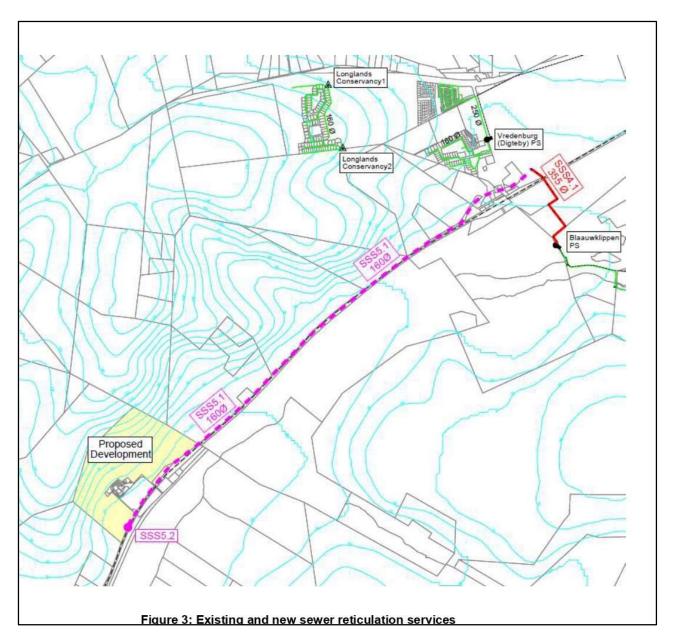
Existing and proposed sewerage reticulation (Courtesy of UDS Africa, 2023). The purple line indicates the alignment of the proposed sewerage pipeline.
